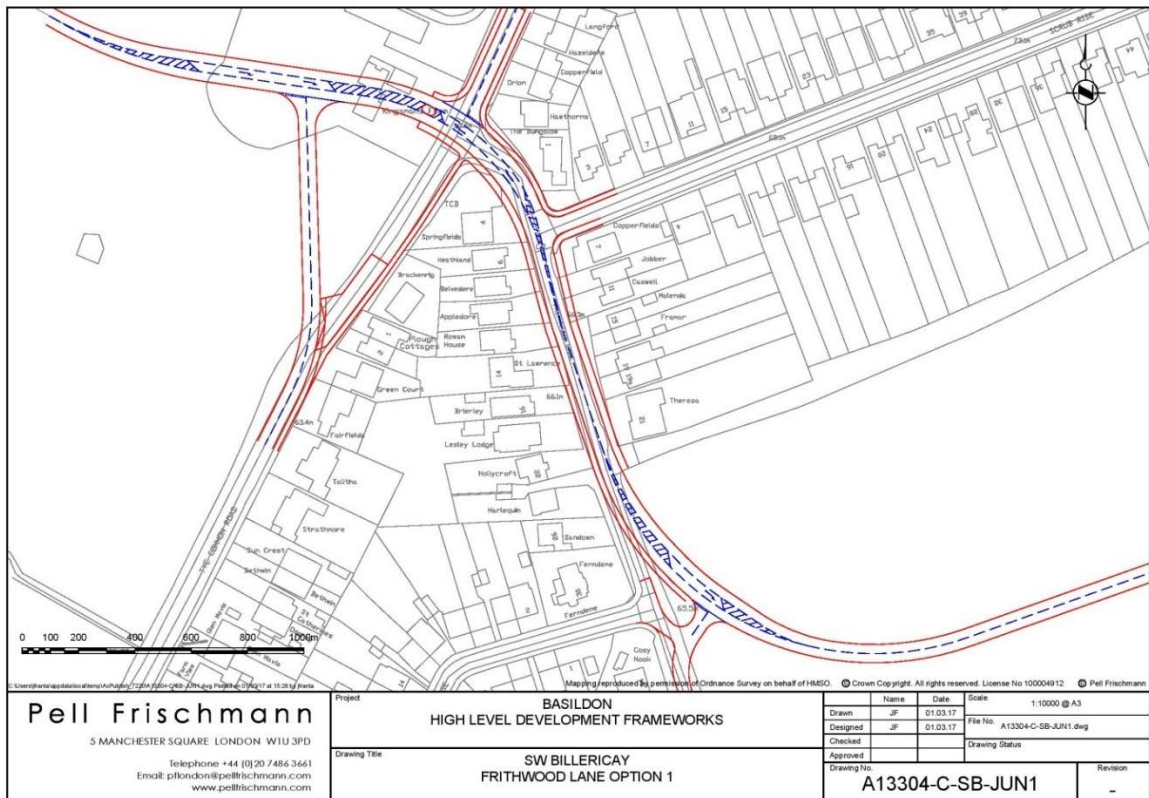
Relief road /Frithwood Ln /Tye Common Rd Indicative Layout
